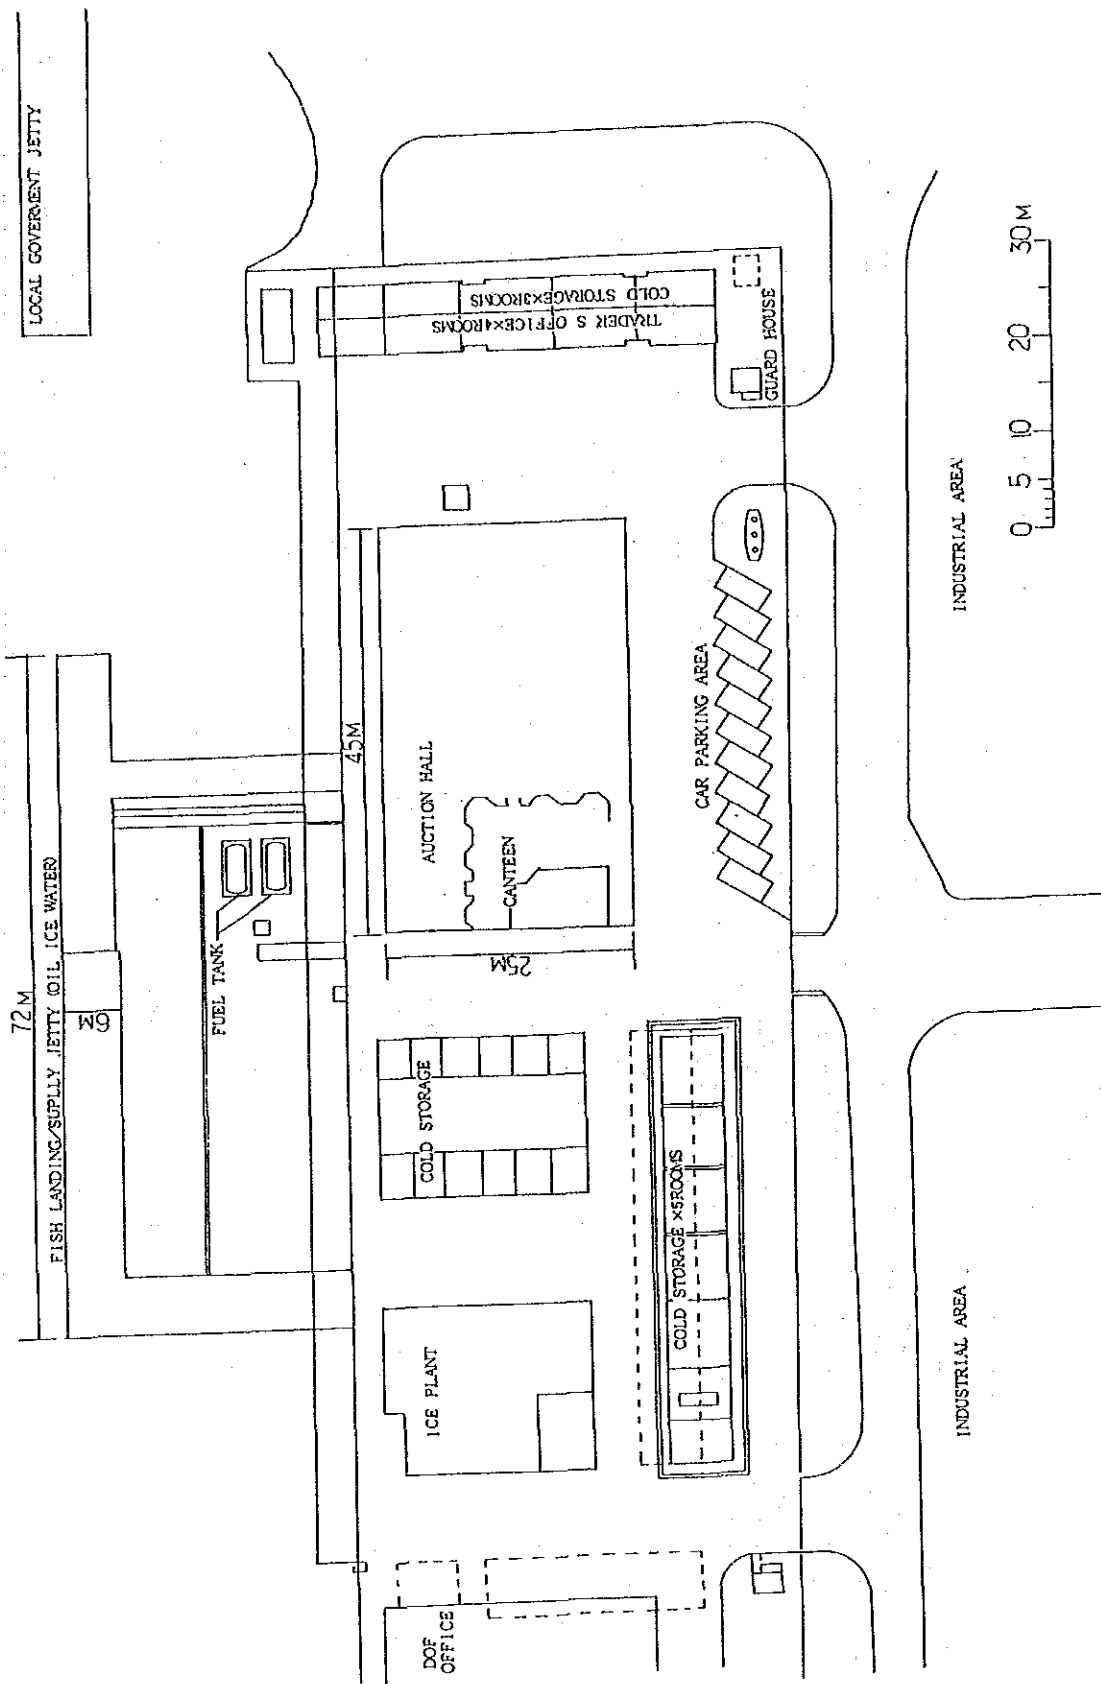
General Layout Plan of LKIM Complex of Bintawa
